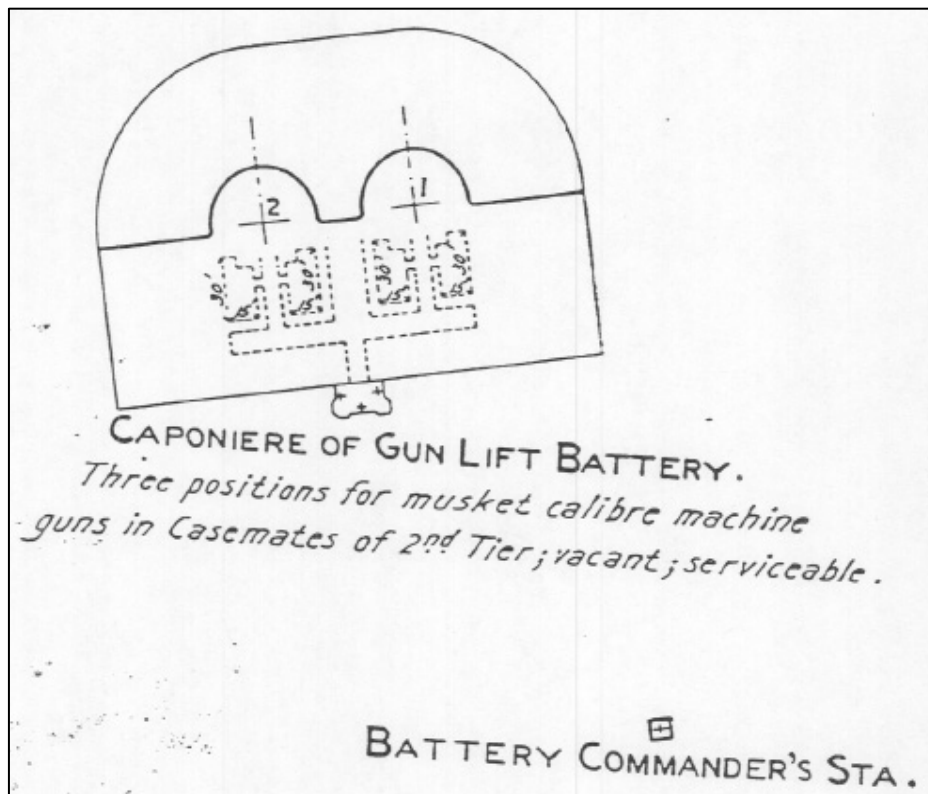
Plan depicting Battery Potter and battery commander’s station/tower, December 31, 1901.
